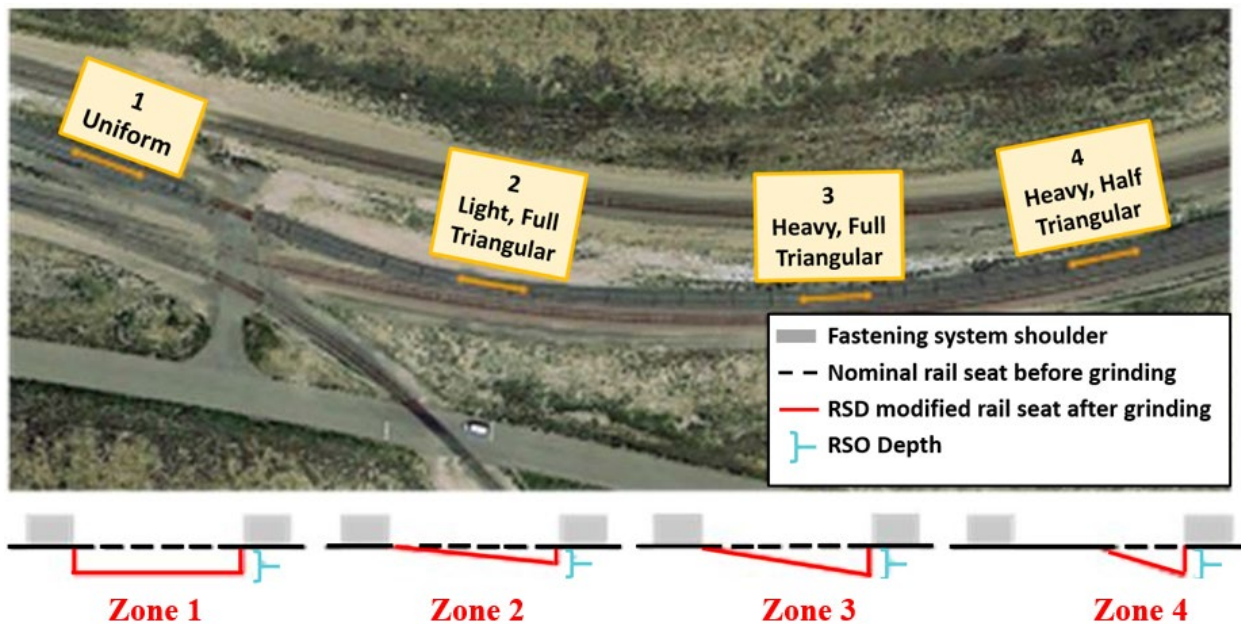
Layout of the Four RSD Zones Installed in the Test Section
